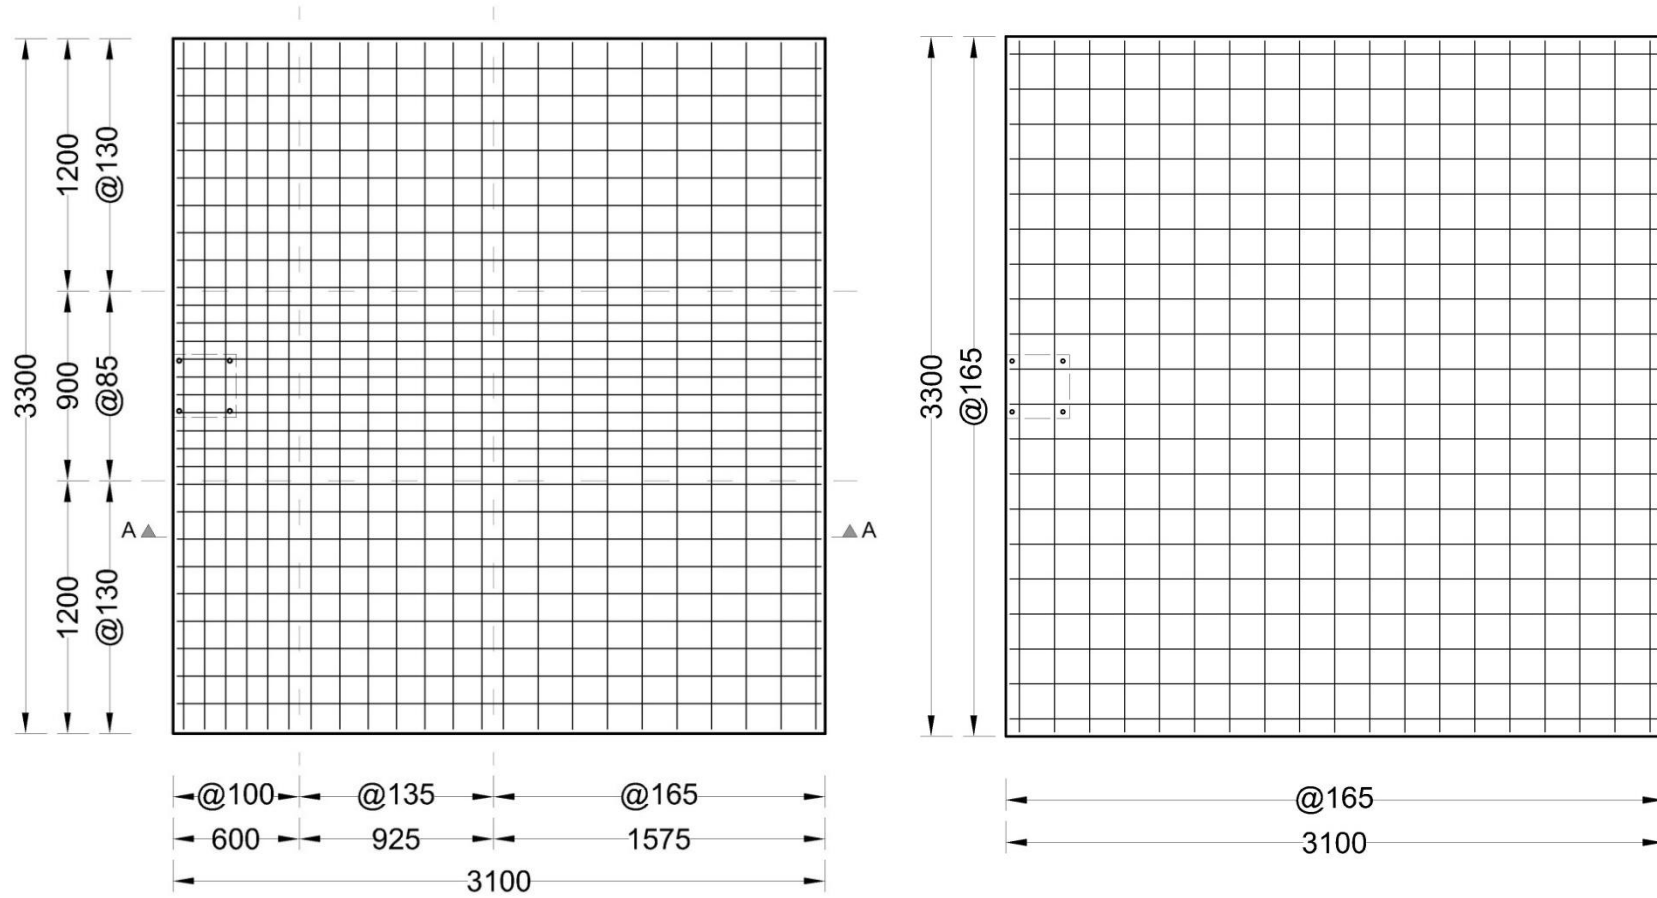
Flexural reinforcement layout for Specimen 1 (dimensions in mm)
